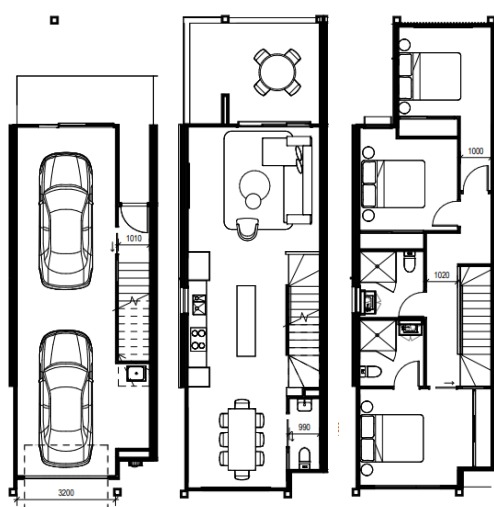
Floor Plans – Portavilla Unit Type Typical (P1)
